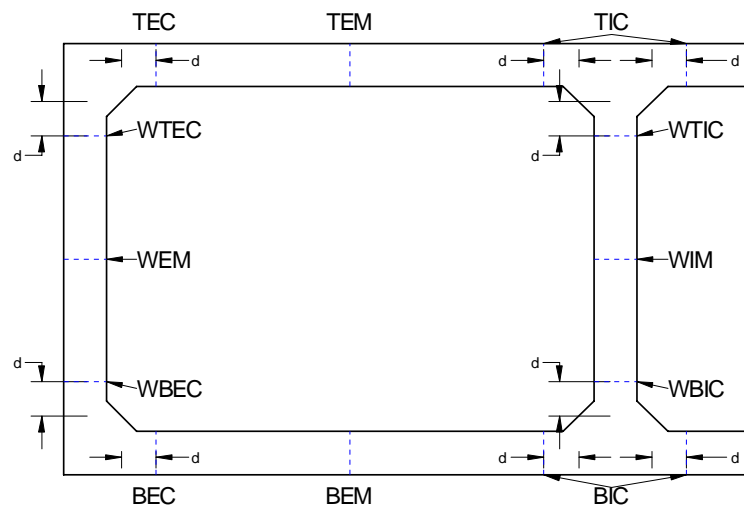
B SHEAR CRITICAL SECTIONS FOR CULVERTS WITH HAUNCHES.
